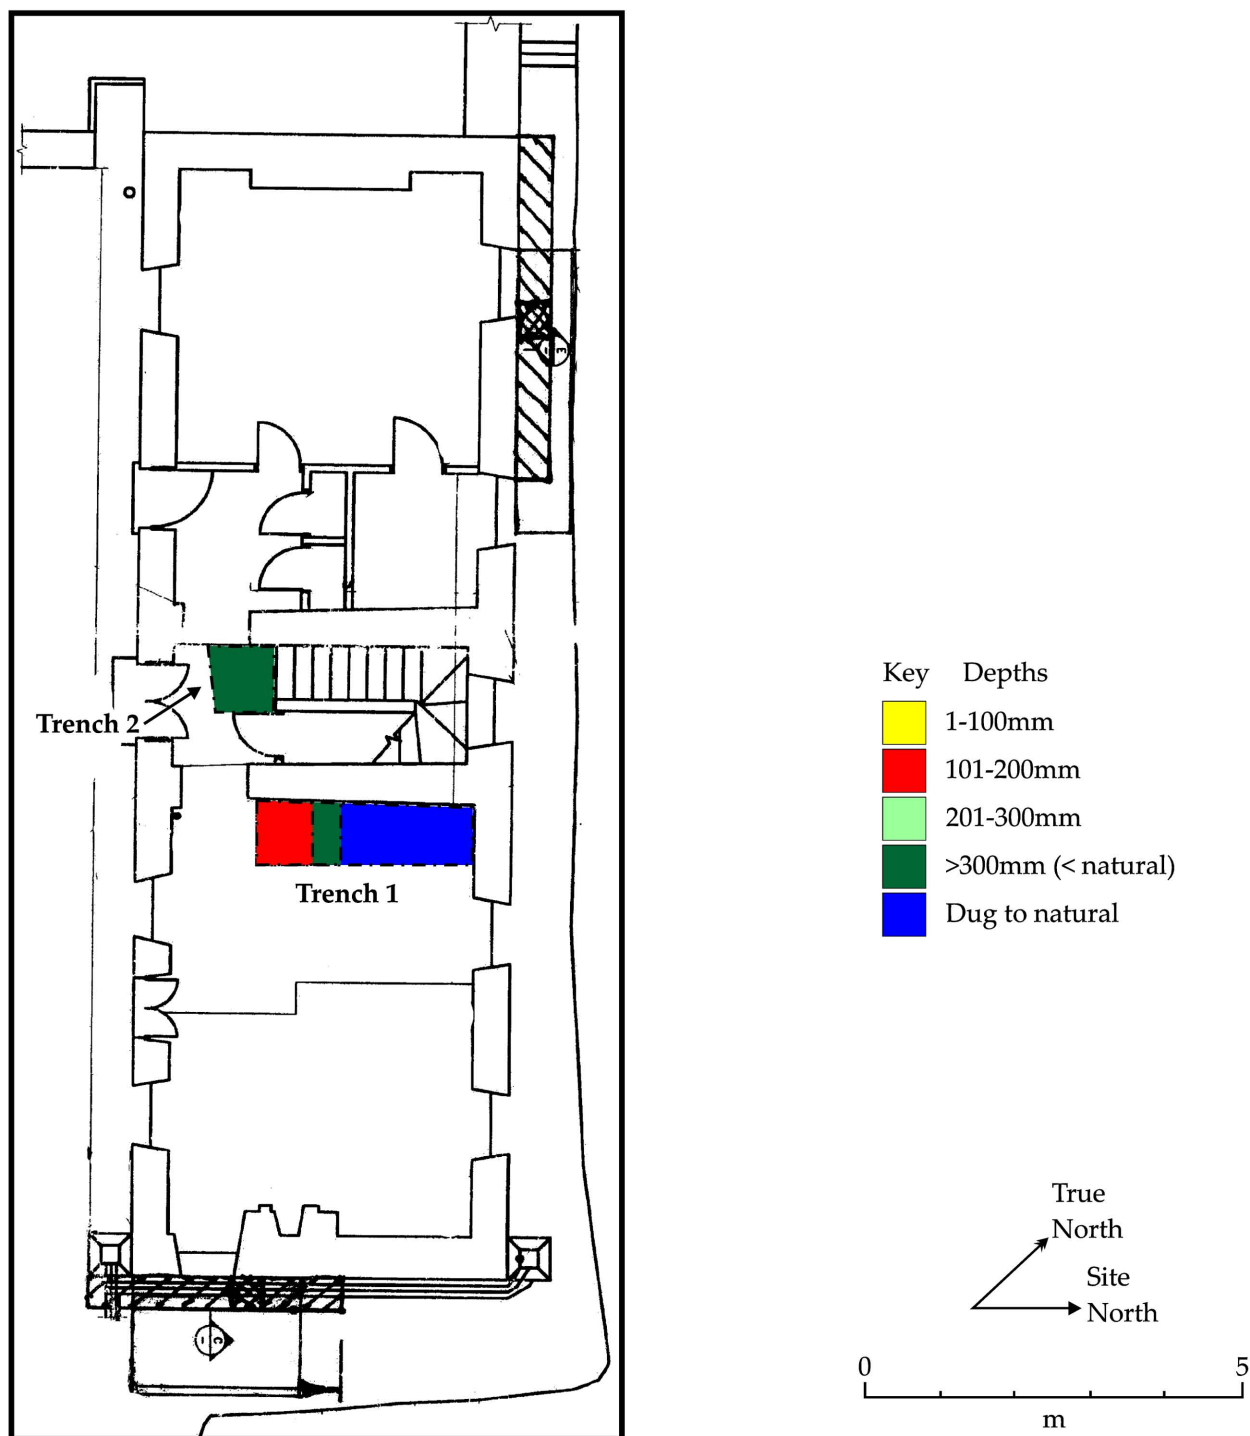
Plan of French Prison showing location and depth of Trenches 1& 2
